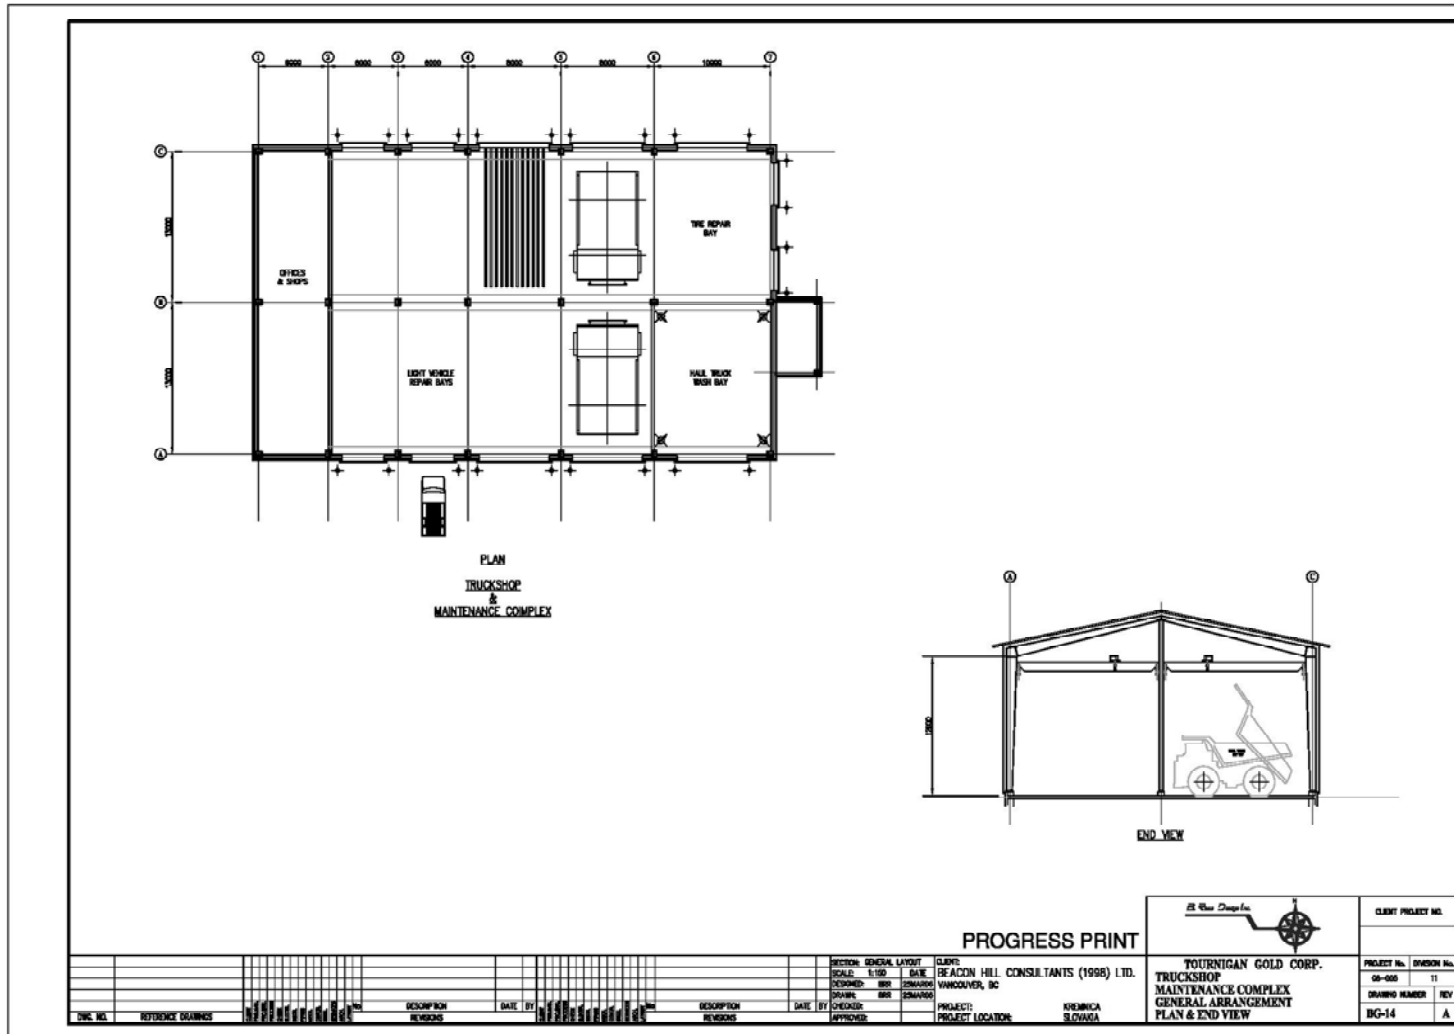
Truckshop Maintenance Complex – General Arrangement Plan and End View
